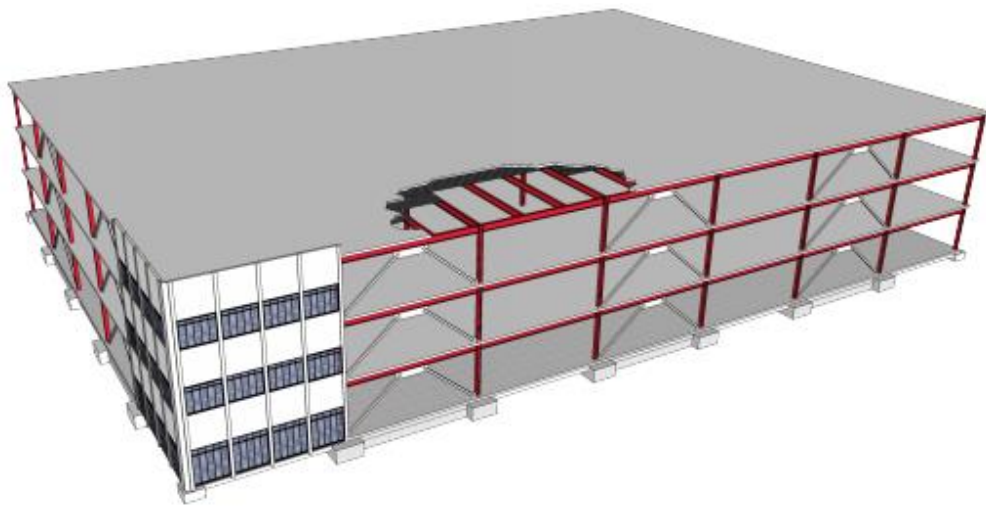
FEMA P-2006 steel braced frame design example building.
